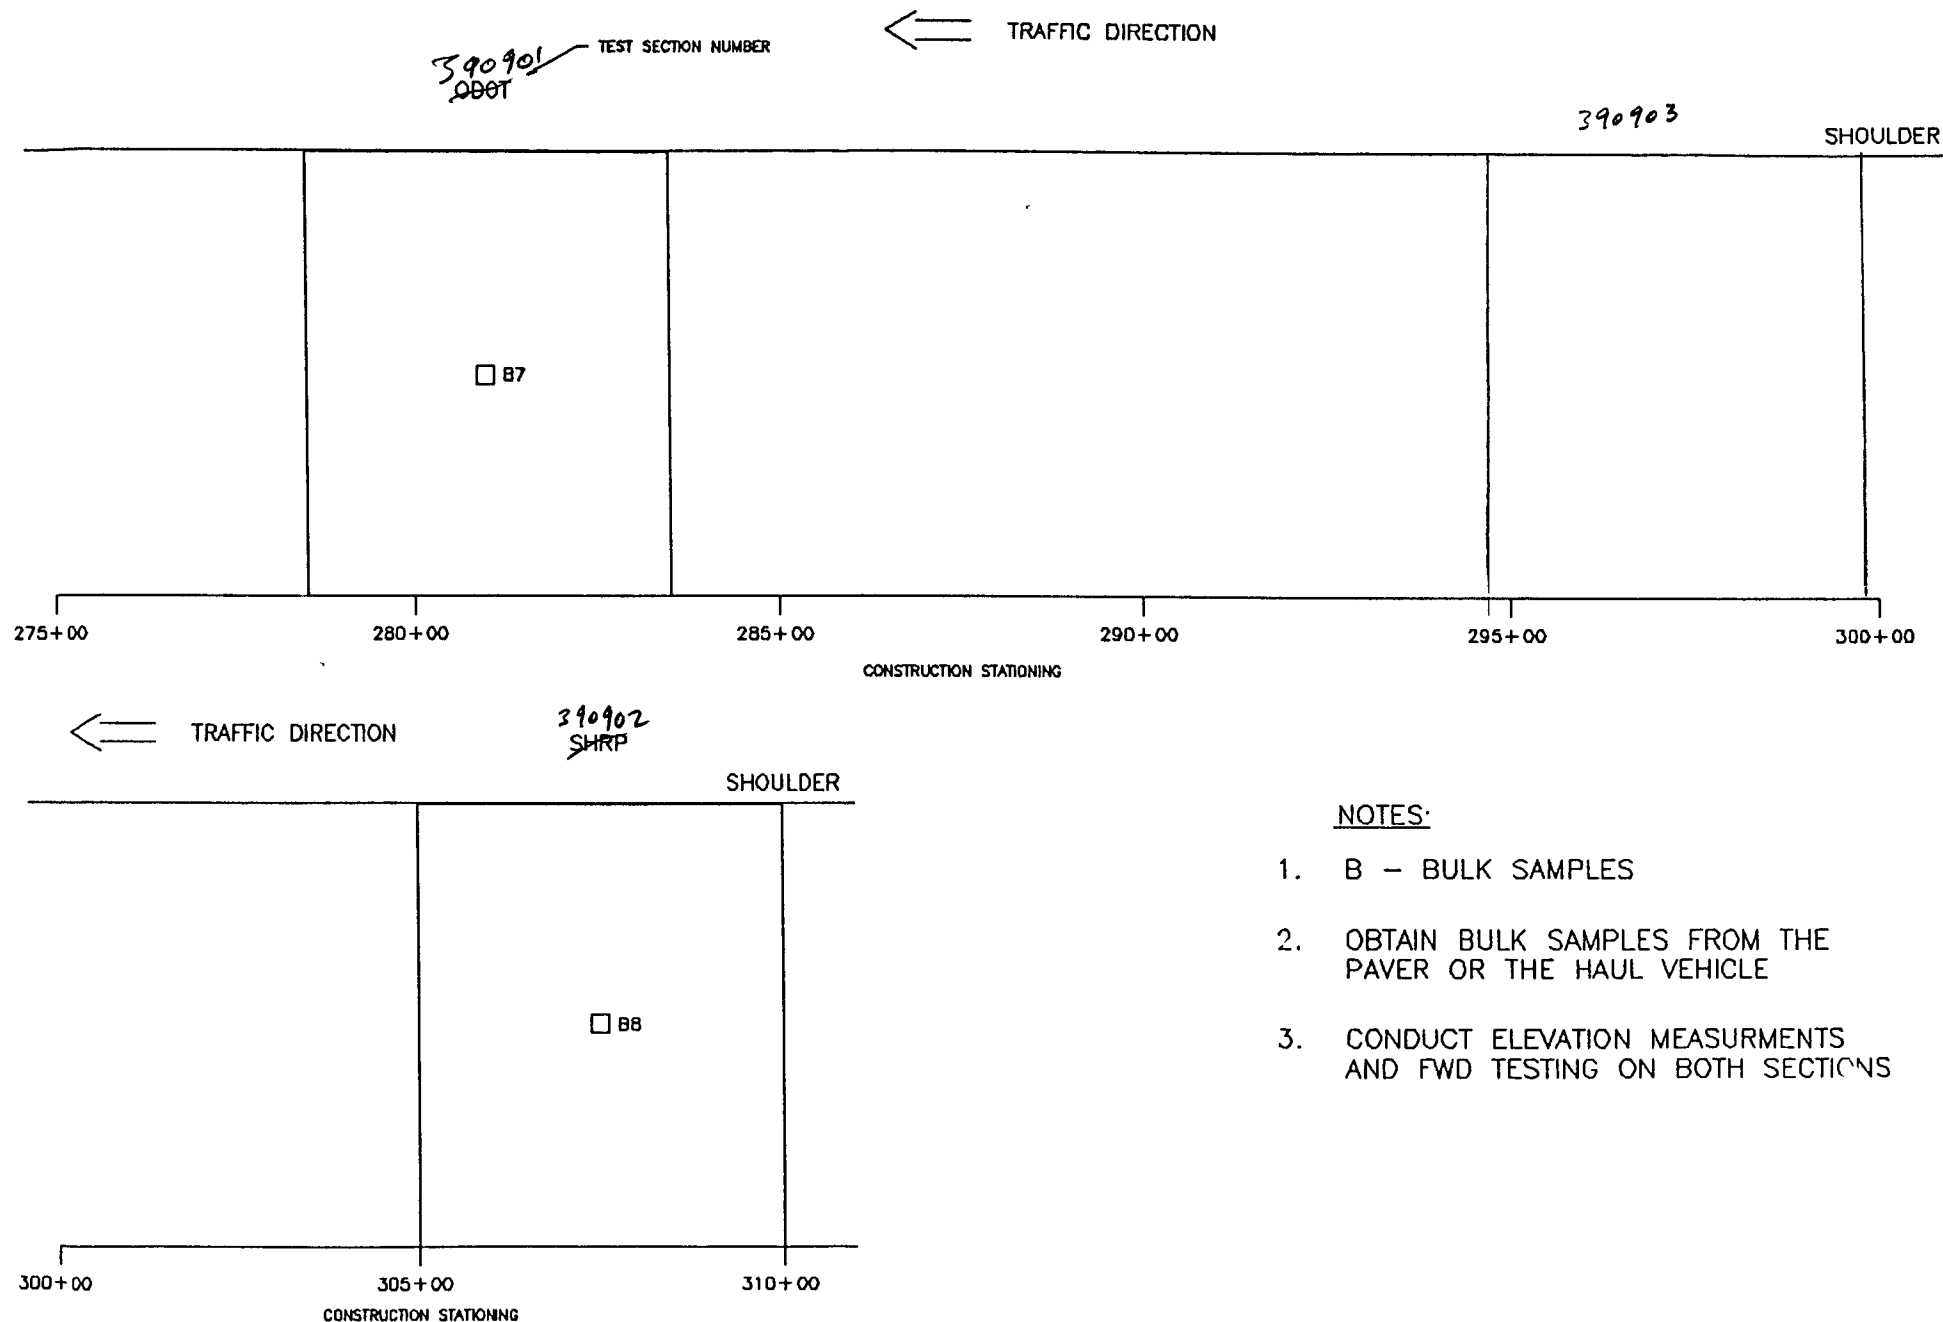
OVERVIEW OF SAMPLING AND FIELD TESTING PLAN
